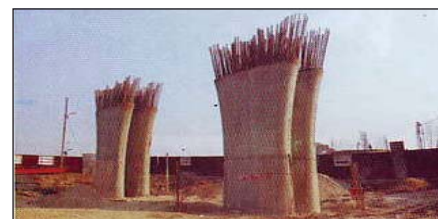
Expansion jt piers (0.75 m thick at top & bottom & 0.6 m thick in center)
